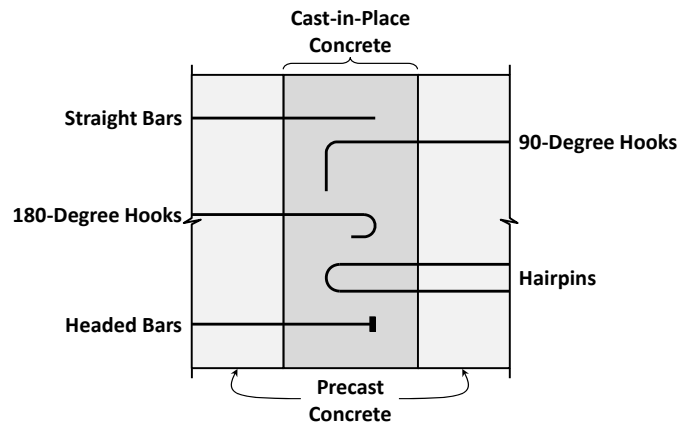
Possible bar details for longitudinal interface reinforcement
